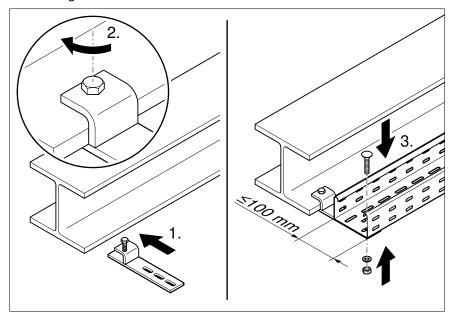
Mounting a beam clamp on a horizontal steel girder
